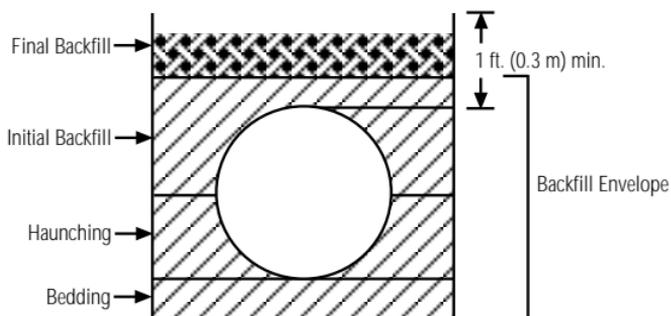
Location of the Initial Backfill Area of the Backfill Envelope
